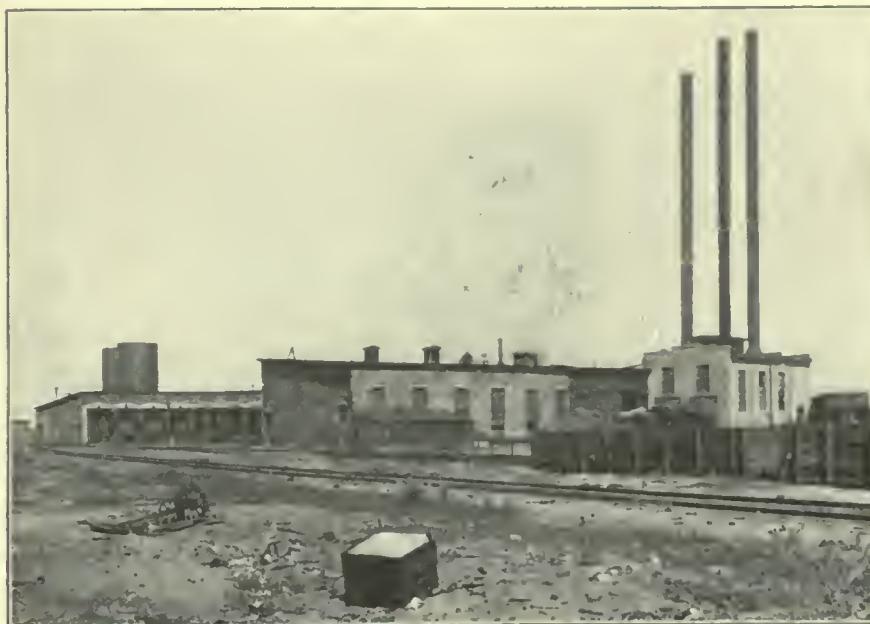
FACILITIES TO BE ABANDONED. Locomotive engine house of the Atchison, Topeka & Santa Fe Railway, near W. 42d Street and S. Central Park Avenue. This house has 31 stalls, each 81 feet long. Seven of the stalls are used as a repair shop. Buildings of this kind are generally of brick construction. Many of them are old and the materials of which they are built have deteriorated due to the effects of smoke and gases so that the salvage value is only sufficient, it has been estimated, to cover the cost of wrecking and removing them.
